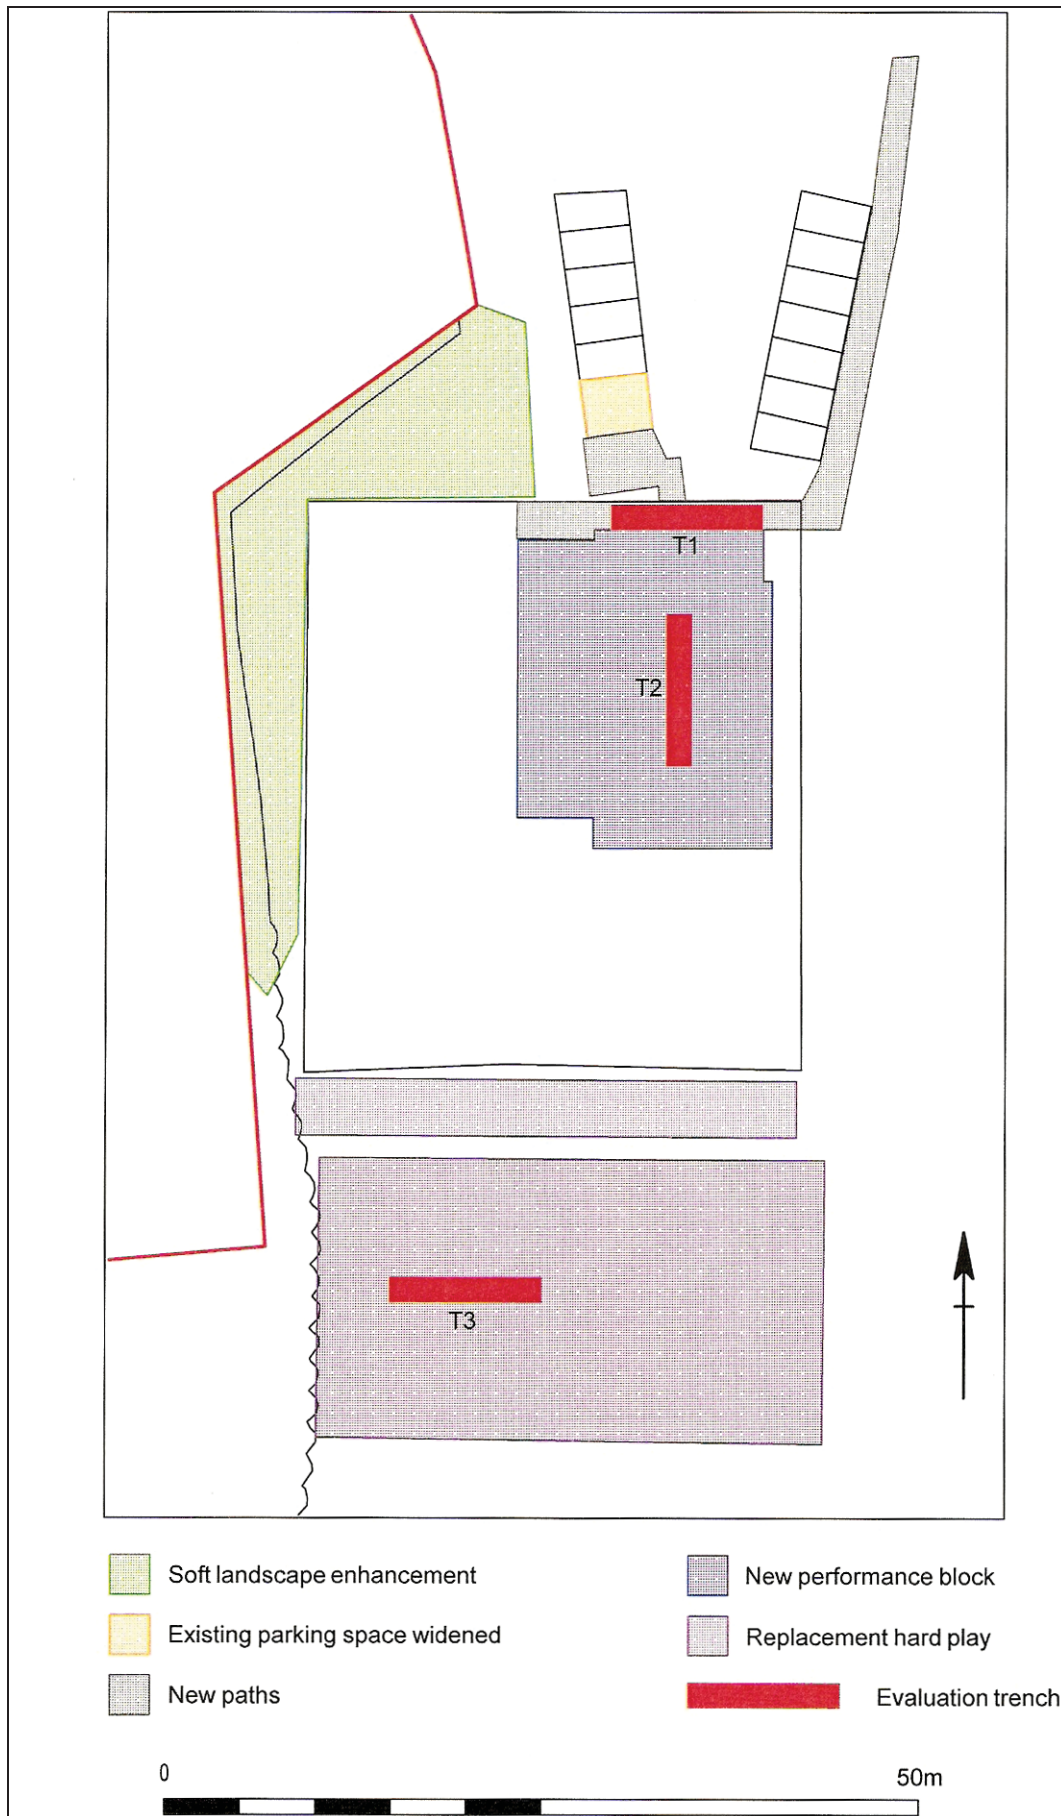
Proposed development plan with trench locations (scale 1:1000)
